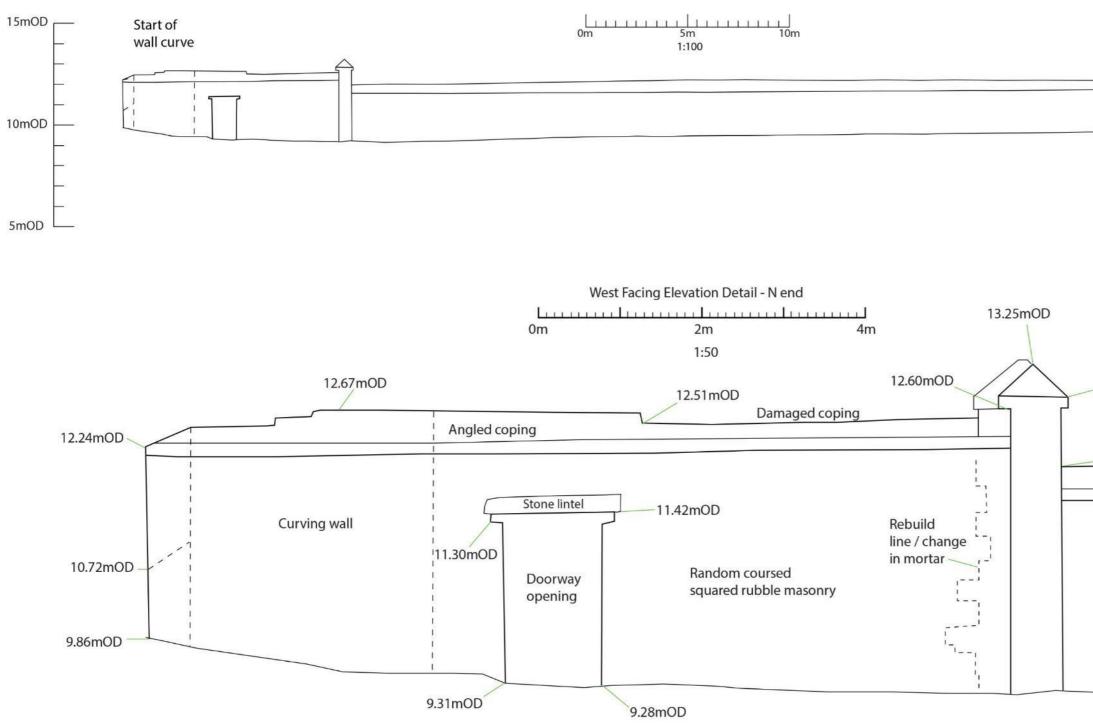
West facing elevation of Structure 2.5. Original survey produced by Merrett Surveys, adapted and annotated by DAT-AS.
